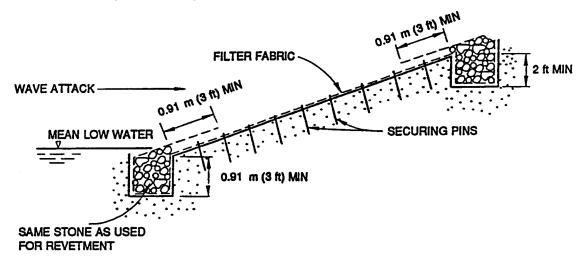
Filter fabric on bank subject to wave attack showing placement of vertical-wall key trench at toe and top bank.
